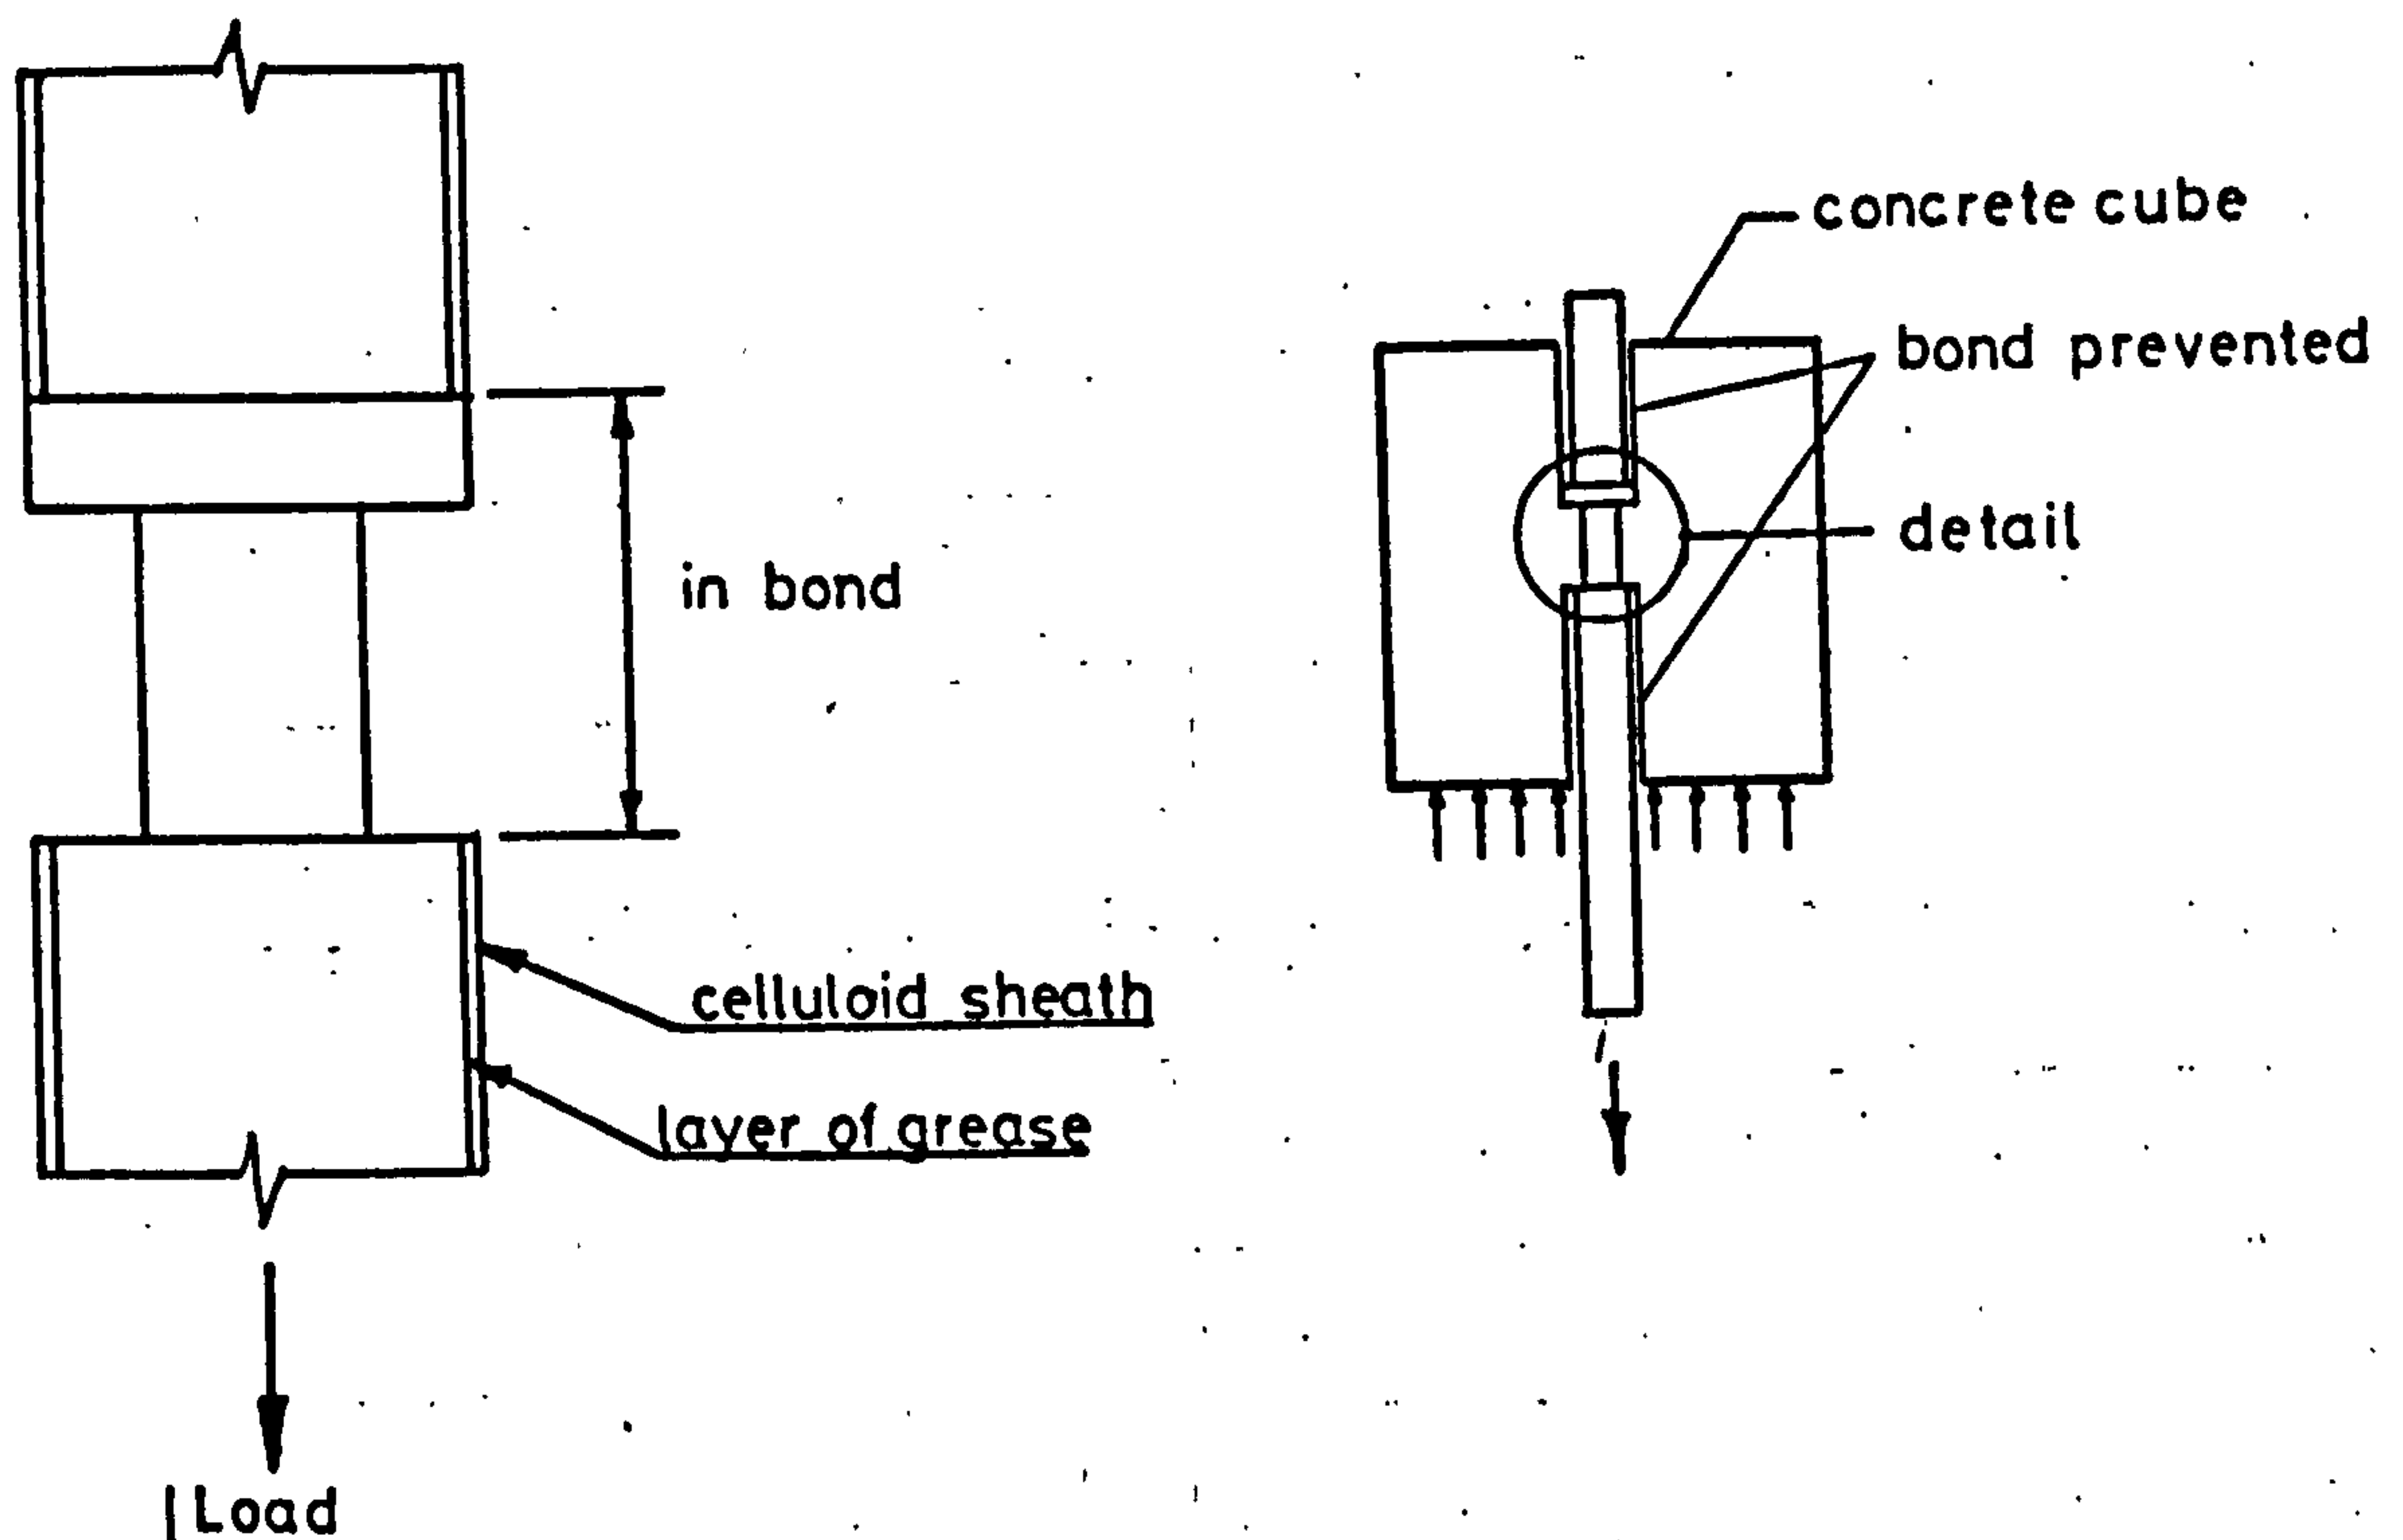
'Fundamental' bond' test specimen. (22)
